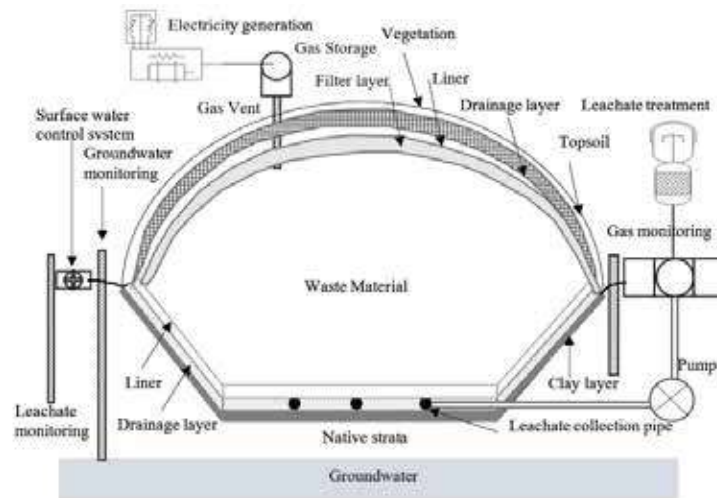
Cross-section of a modern containment landfill with on-site leachate treatment facilities and electricity generation from landfill gas facilities
